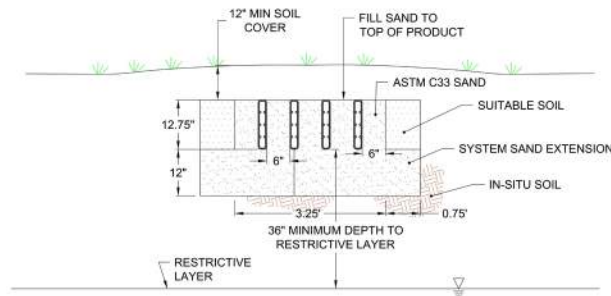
Detailed cross-section of an example in-ground AeroFin System
